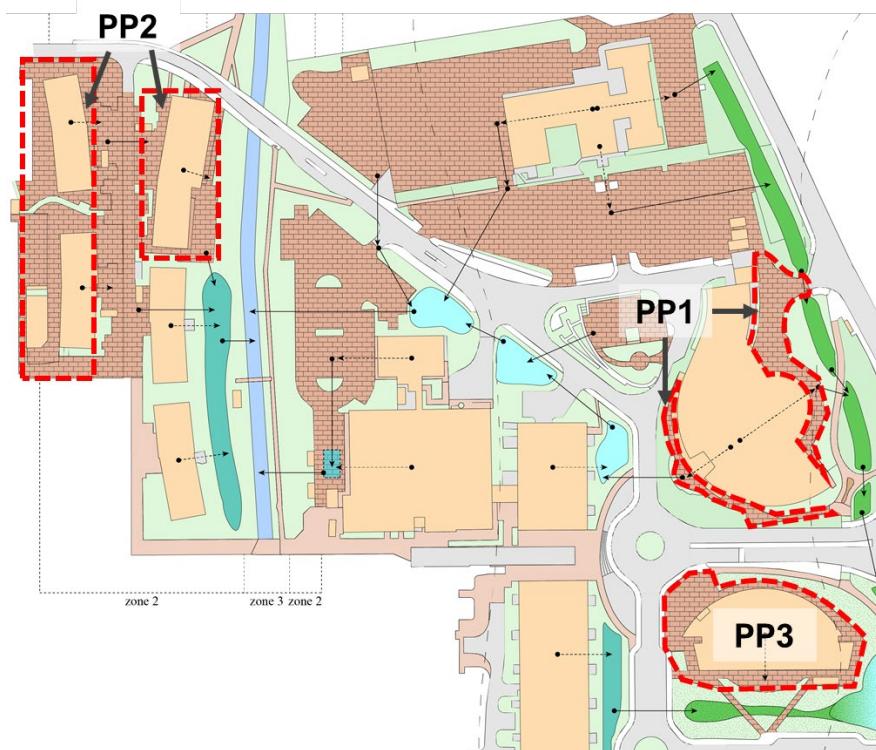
Proposed pervious pavement scheme for pedestrian footpaths
